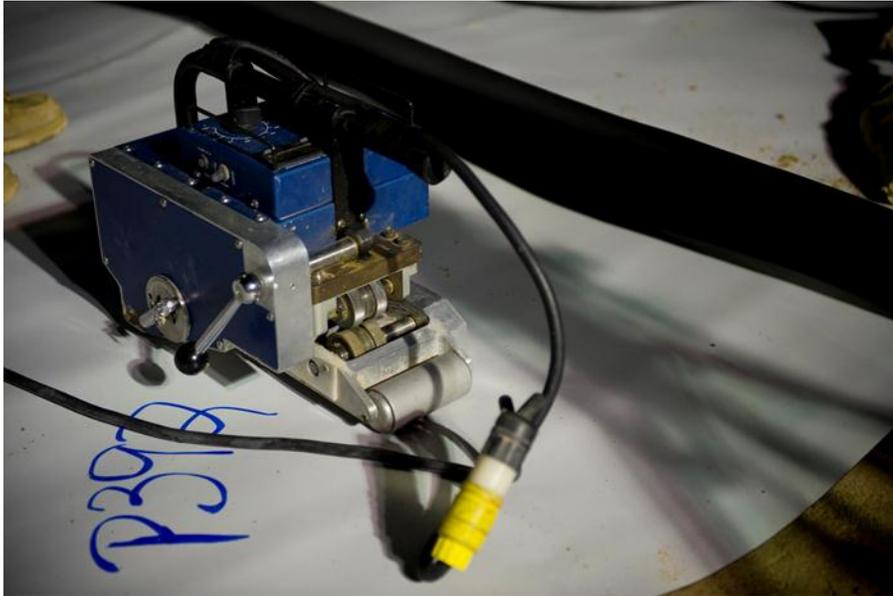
Dual-hot-wedge welder.
